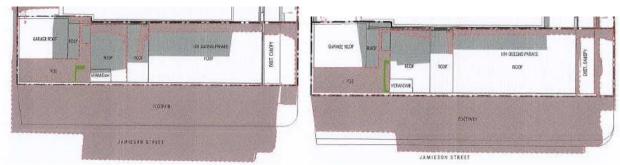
Additional overshadowing shown in green at 9am and 10am (Applicant submission – advertised plans)
